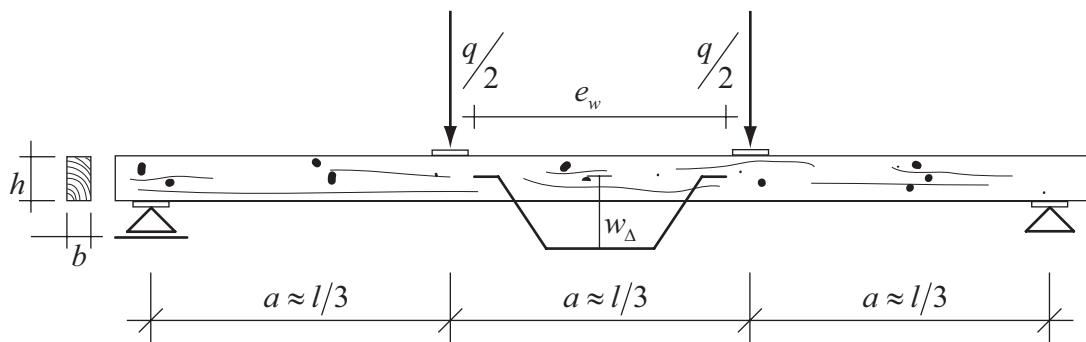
Typical bending test configuration; a , b , e_w , h are the specified dimensions, q and w_Δ are the measurements.
